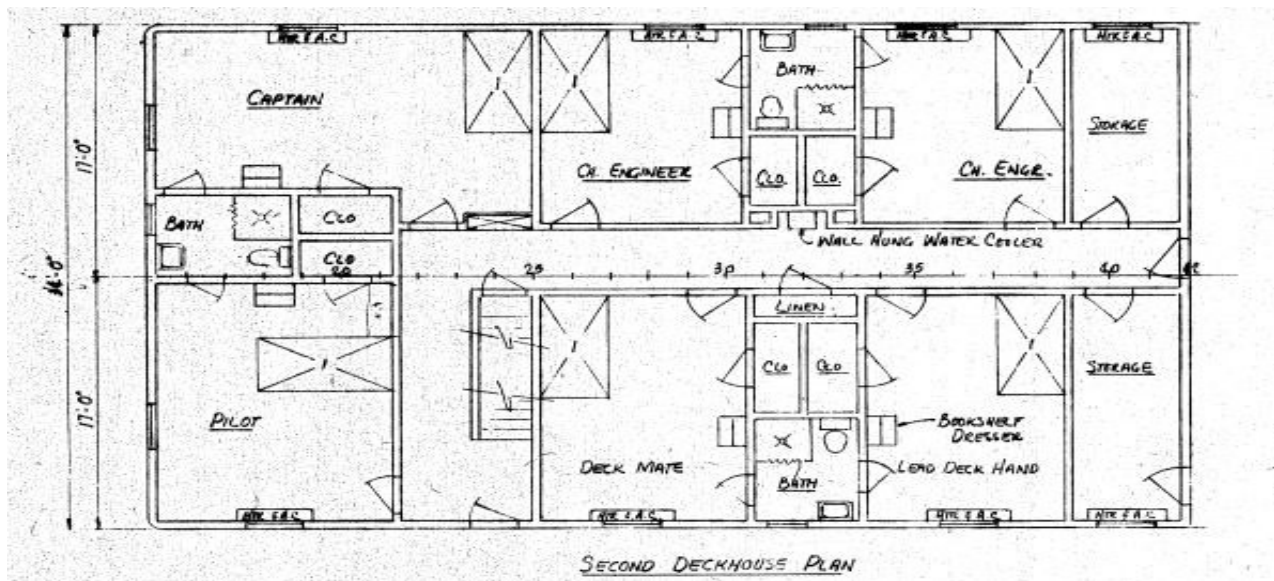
Typical layout of inland towing vessel with “Jack and Jill” style bathroom between berthing spaces.
